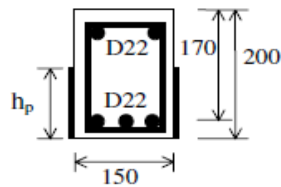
10- Cross section of beams (Adhikary and Mutusyoshi 2006).
